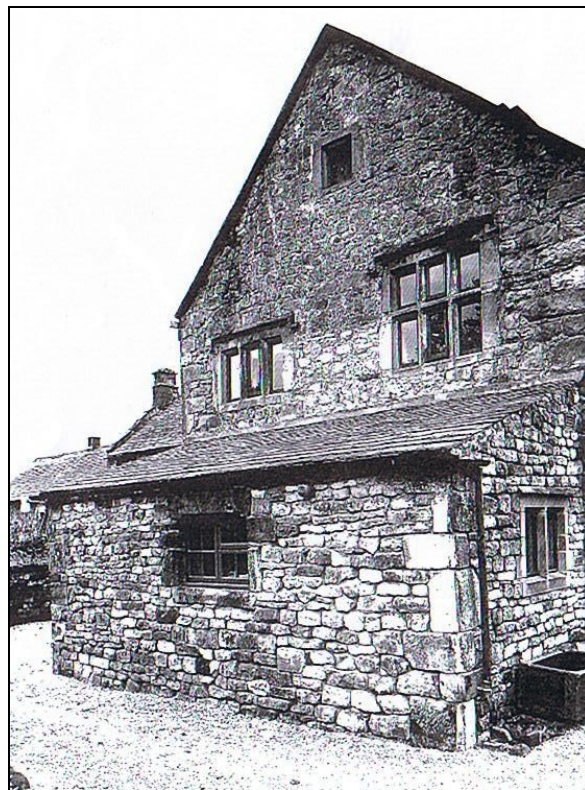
East elevation of Strickland Hall, 1988 RCHM 28/2157
